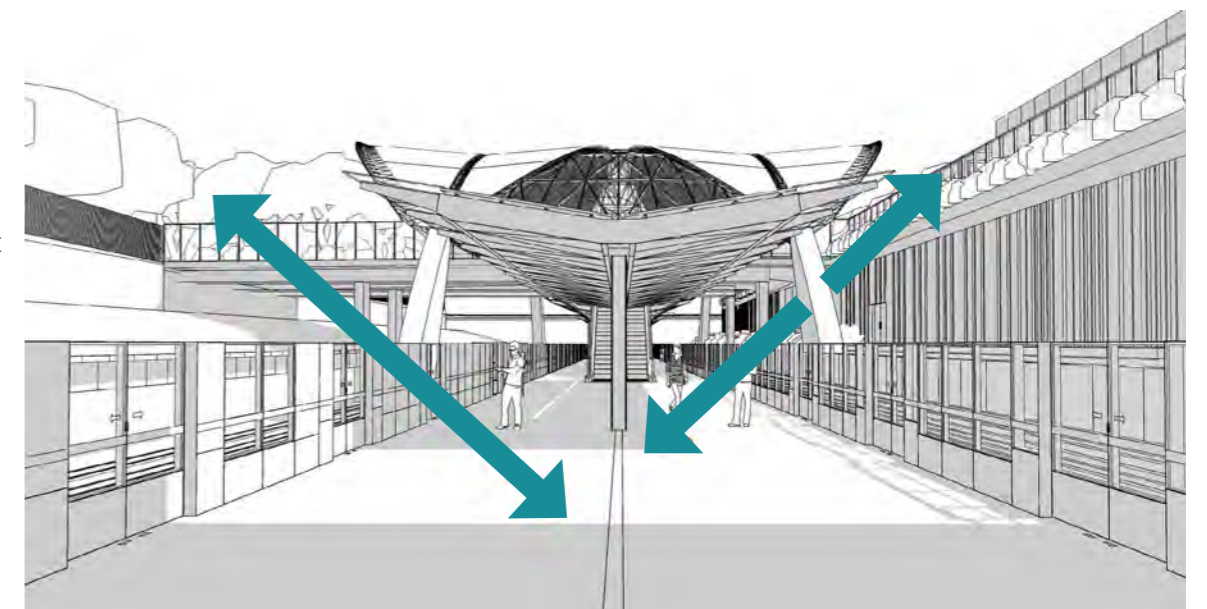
Clear Sight Lines from the Station Platform-Bella Vista Station. Source: HASSELL.
